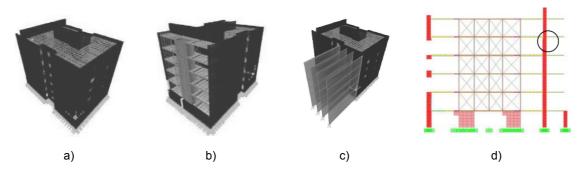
Numerical Model (Branco, 2007): a) Global model of the building; b) Back façade wall with the ceramic brick balconies; c) Final model taking into account the adjacent reinforced concrete building; d) Cross section of the building with the reduction of the masonry wall thickness between the 4th and the 5th floor.
